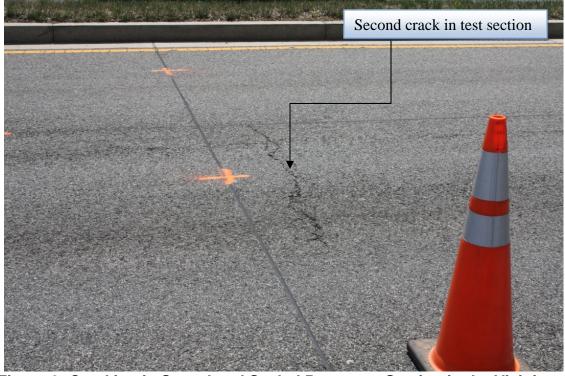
Cracking in Sawed and Sealed Pavement Section in the Vicinity of a Transverse Saw Cut.
